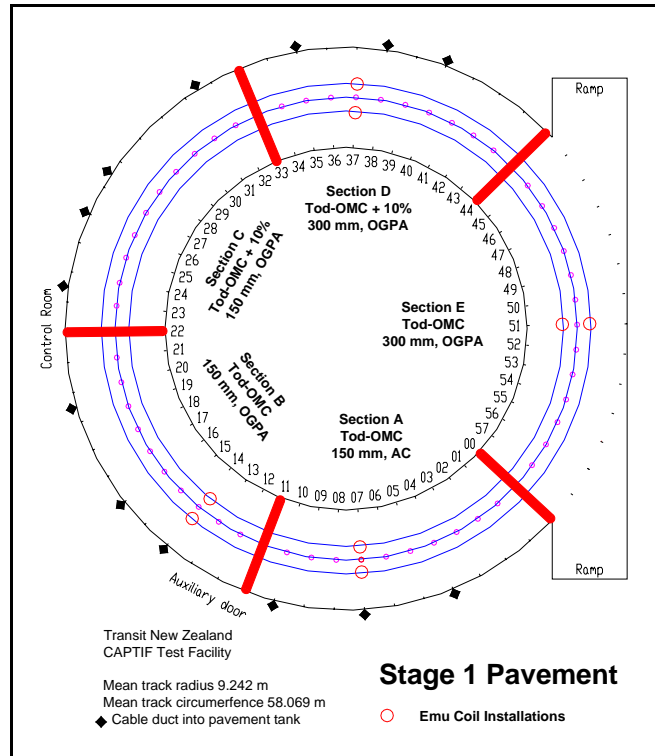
Pavement sections and instrument locations on the CAPTIF test facility for Pavement Test 1.
